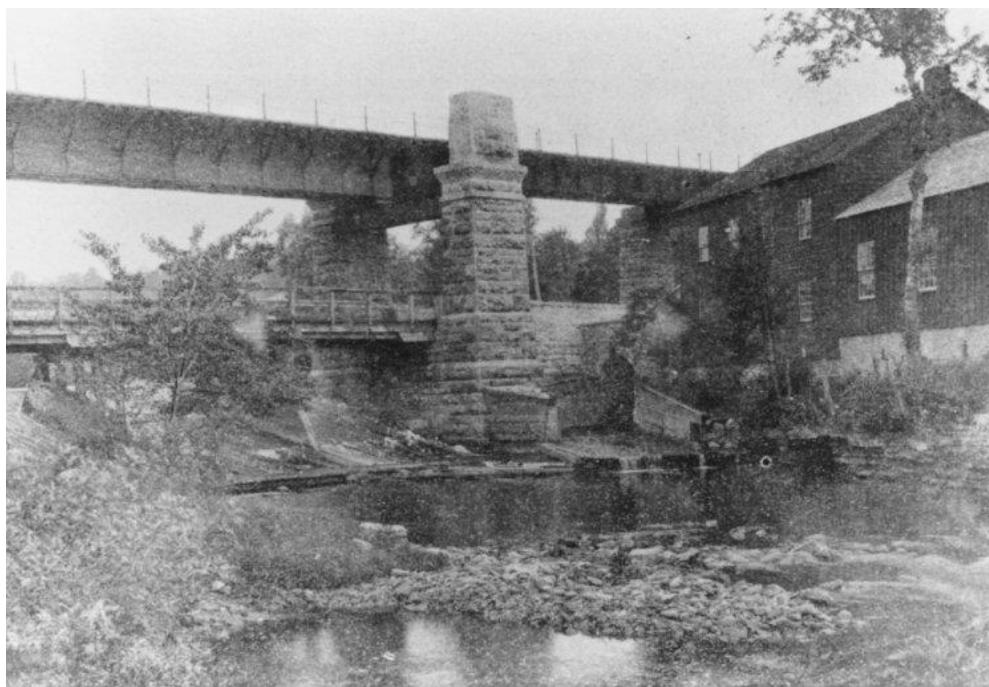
Allan's Spillway, Allan's Sluiceway, and Allan's Bridge, with carding building at right, 1889 (Guelph Public Library, 2022)
